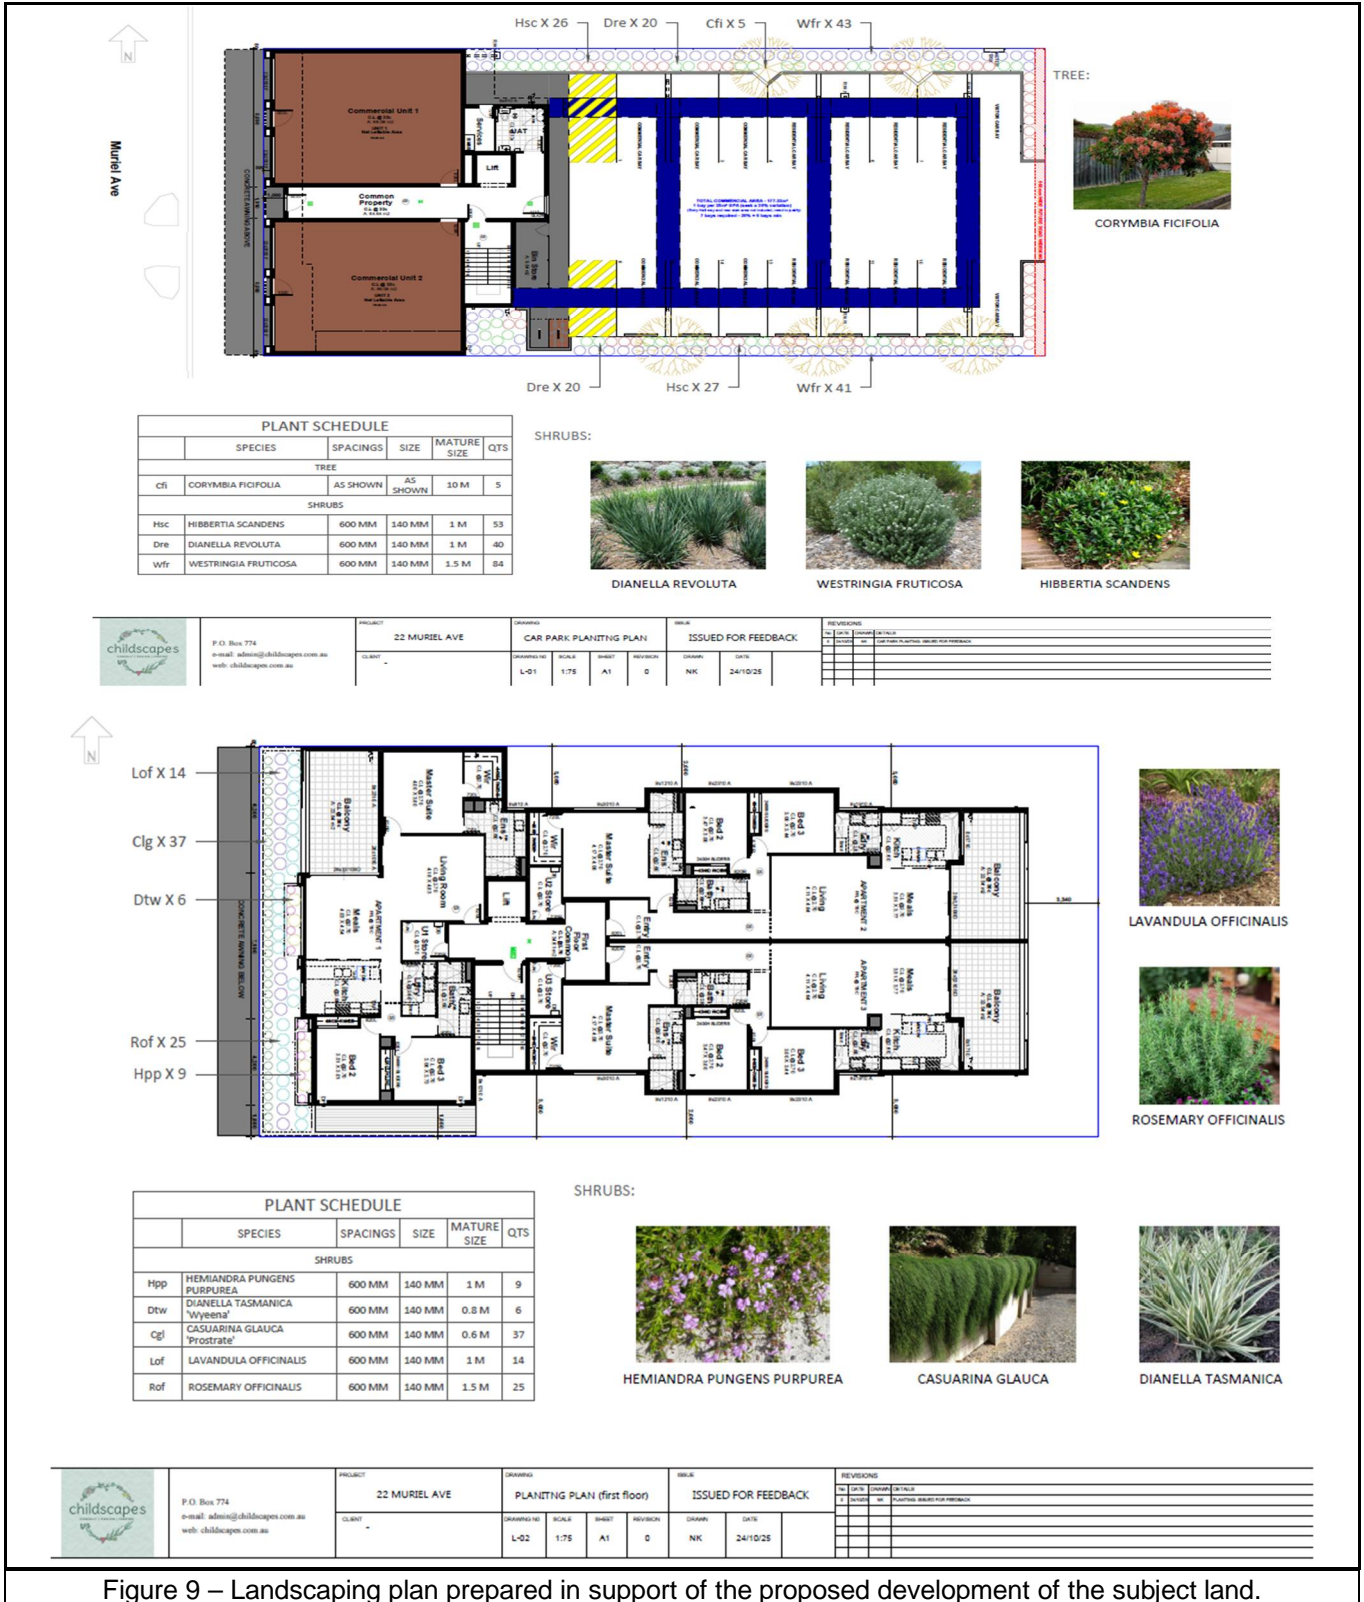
Landscaping plan prepared in support of the proposed development of the subject land.
